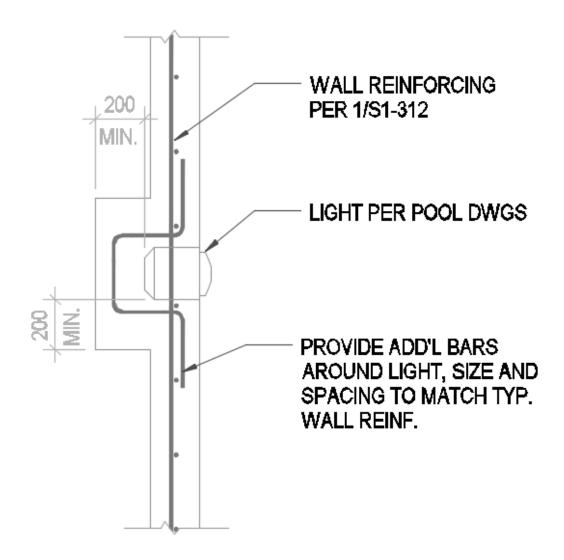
Swimming Pool Skimmer Details (Continued)
